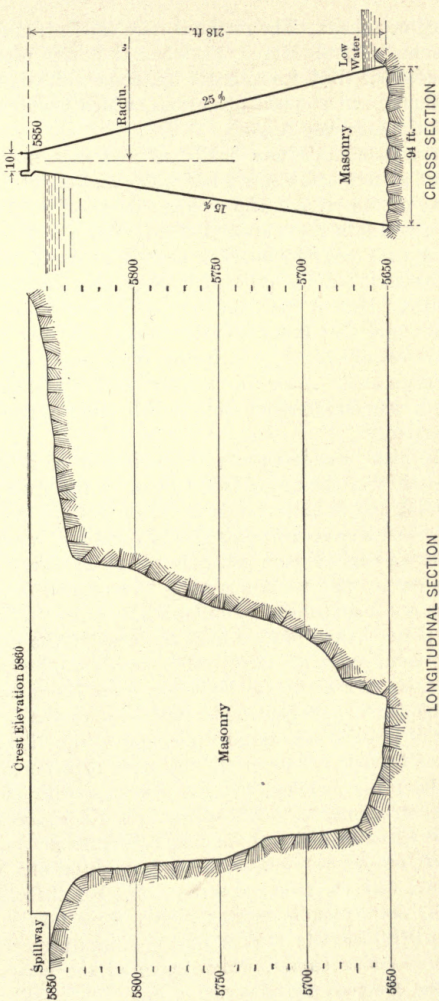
Profile and Section of Pathfinder Dam, North Platte River, Wyoming.
